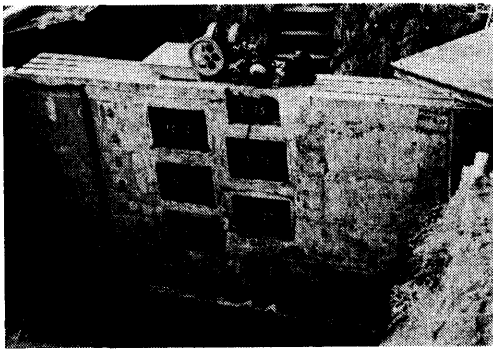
Pressure cells fixed on the vertical surface of the wall, backfill sand being removed
